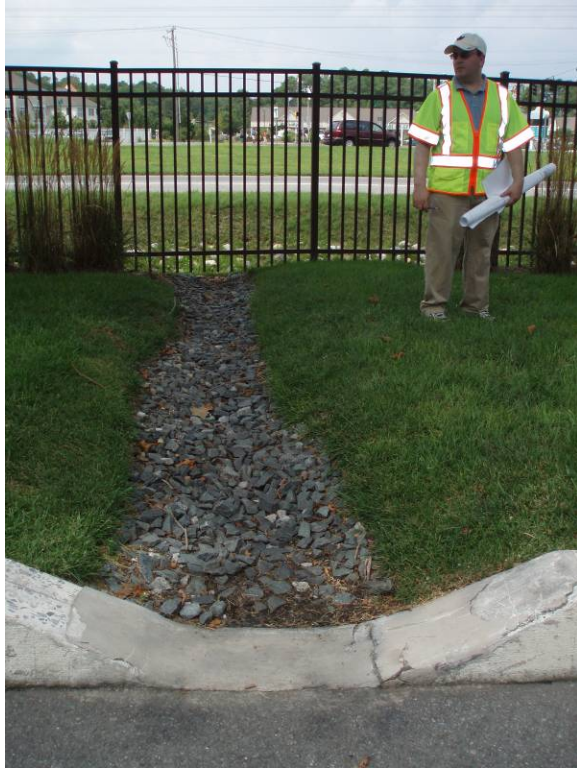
&2: Curb Openings at Sea Colony Parking Lot
